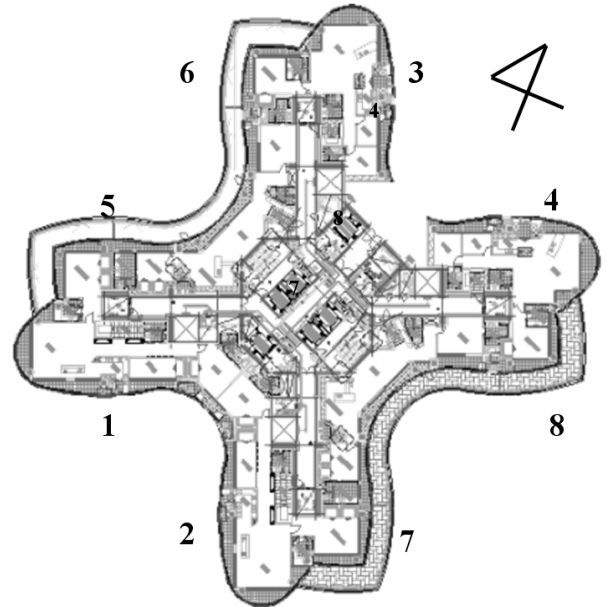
Pressure measurement points of exterior wall at 80th floor of tower A.
